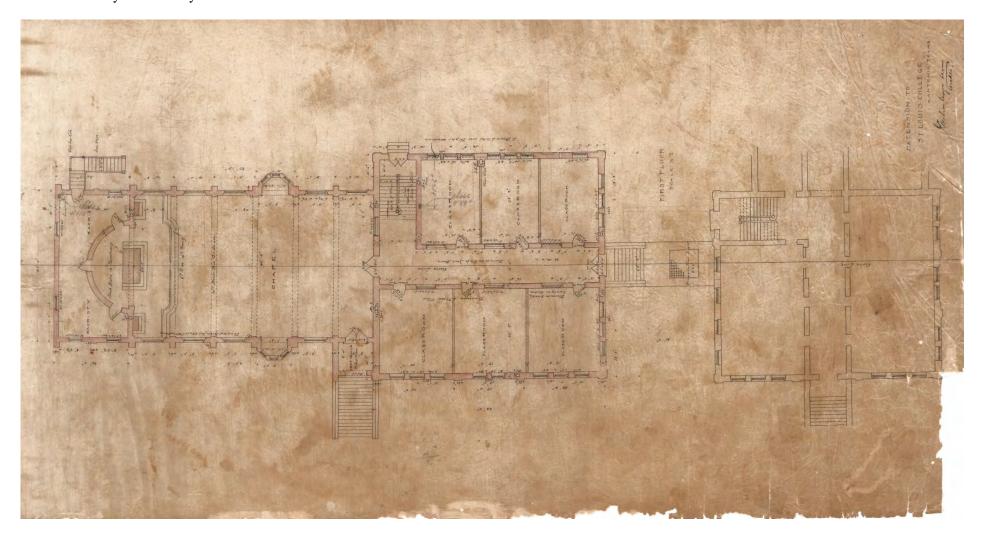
James Wahrenberger, Reinbolt Hall Construction Drawings, Second Floor Floorplan, 1908 Source: St. Mary's University Archives
